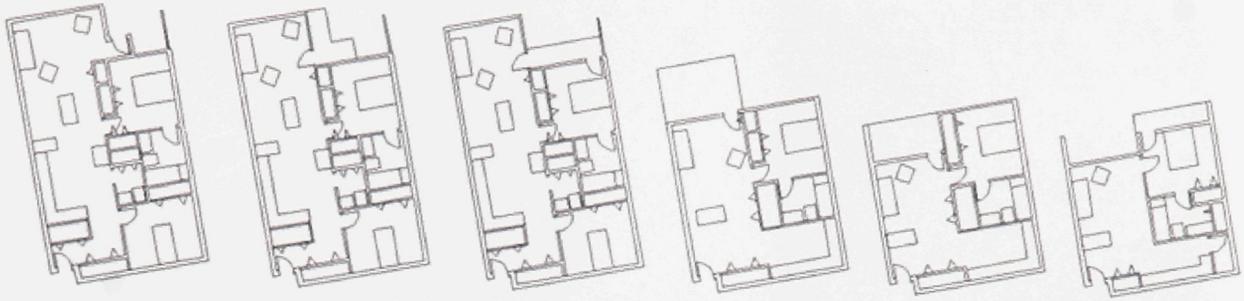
there are a variety of units available from two bedroom (+living, kitchen, dining, breakfast area, bath and powder room) to one bedroom (+living, dining, bath and small kitchen)
